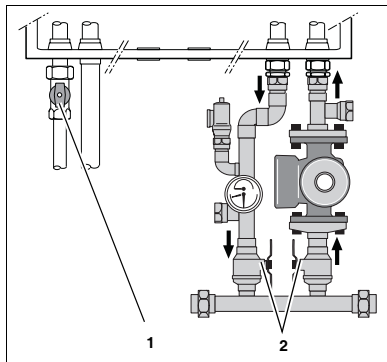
Opening the gas shut-off valve and the boiler manifold shut-off valves
